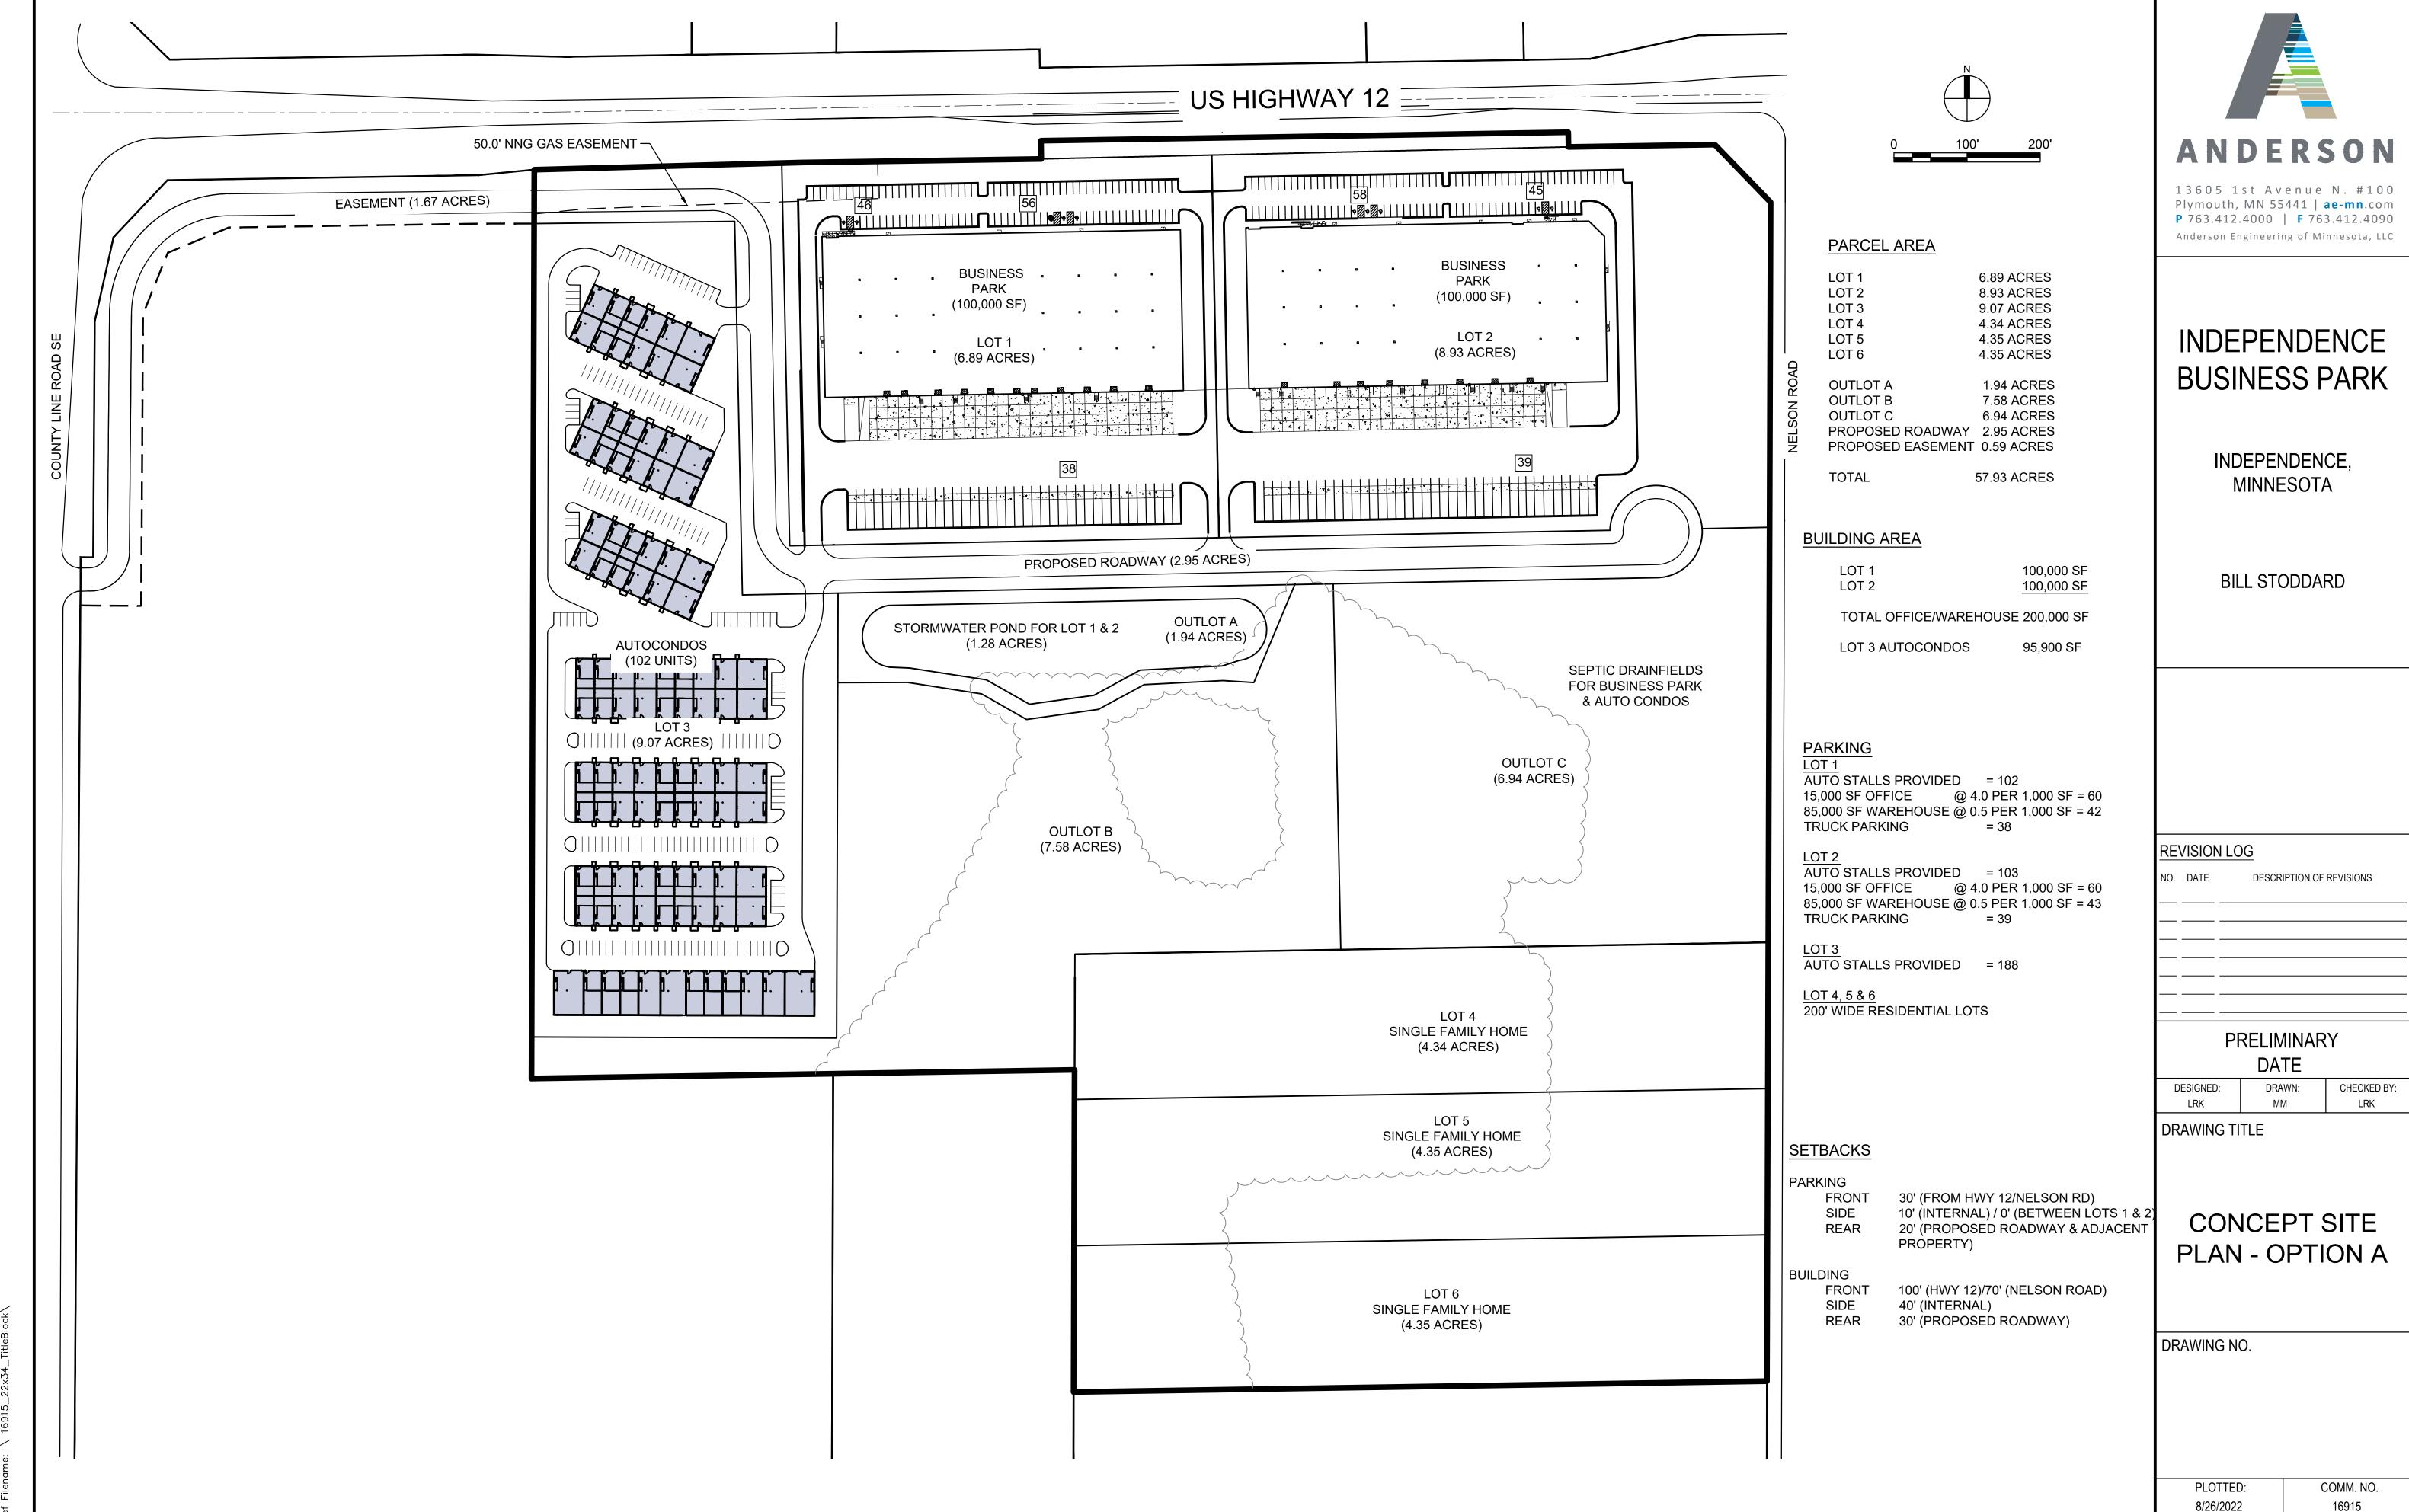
Site Plan Options, Landscape Plantings Plan & Planting Plan with Aerial by Anderson Engineering.
